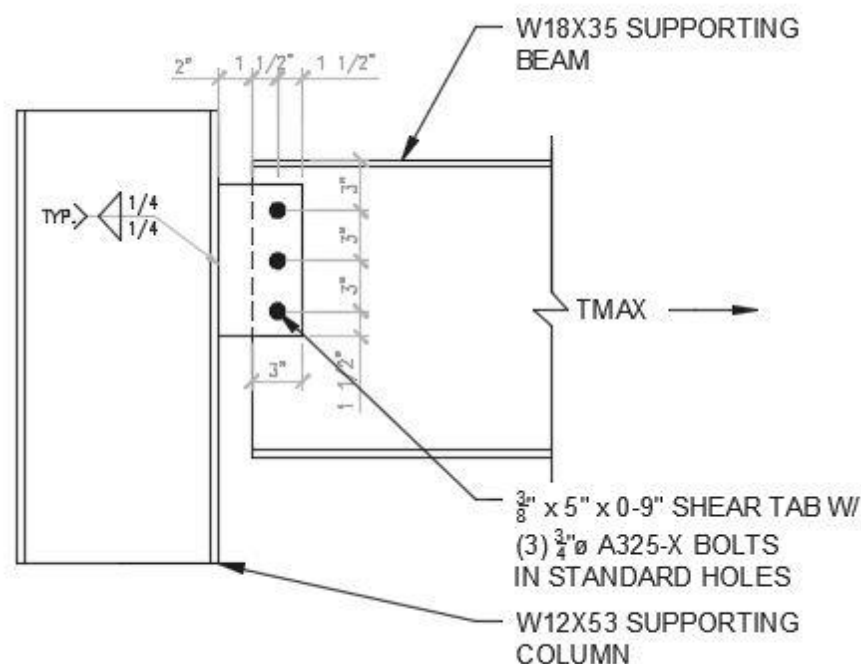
Typical Three Bolt Shear Tab Connection Configuration – Tension Case.
